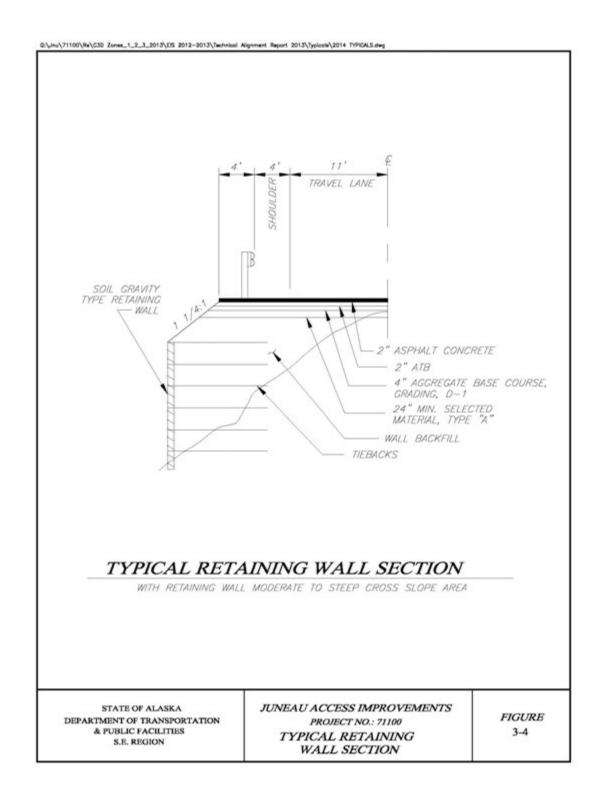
Typical Retaining Wall Section (Moderate to Steep)
